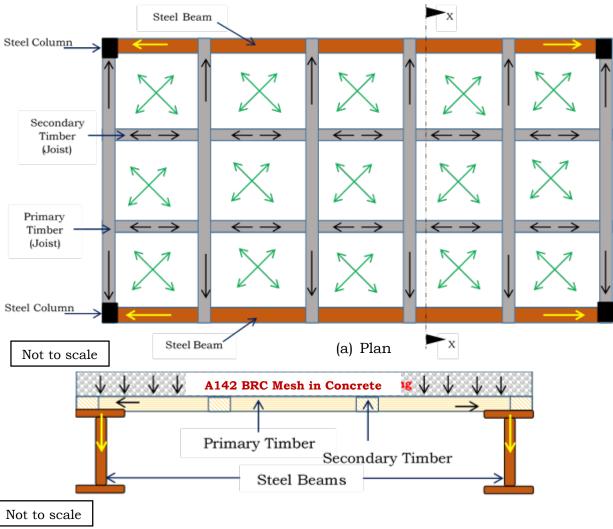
Idealised layout for STC slab (Configuration 1)
